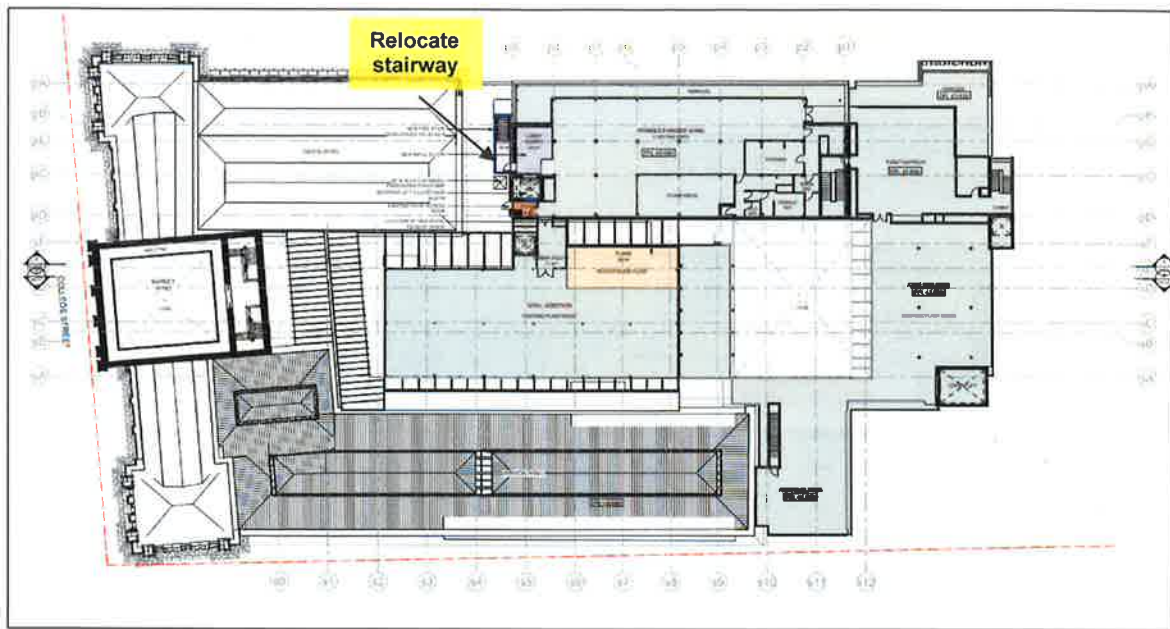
| Level 3 floor plan (Source: Applicant's RtS).
